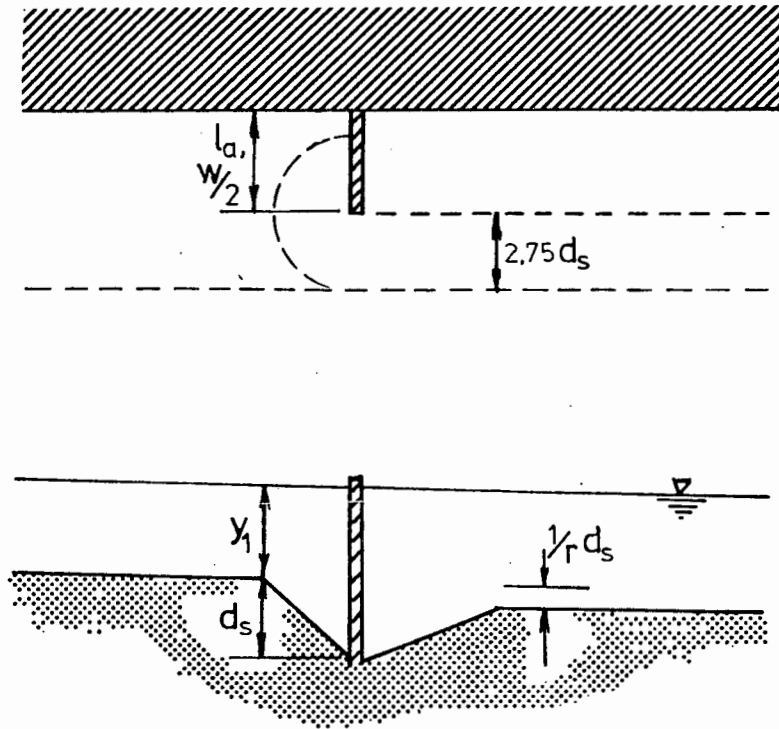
Definition Sketch of Clear-water Scour at Piers
